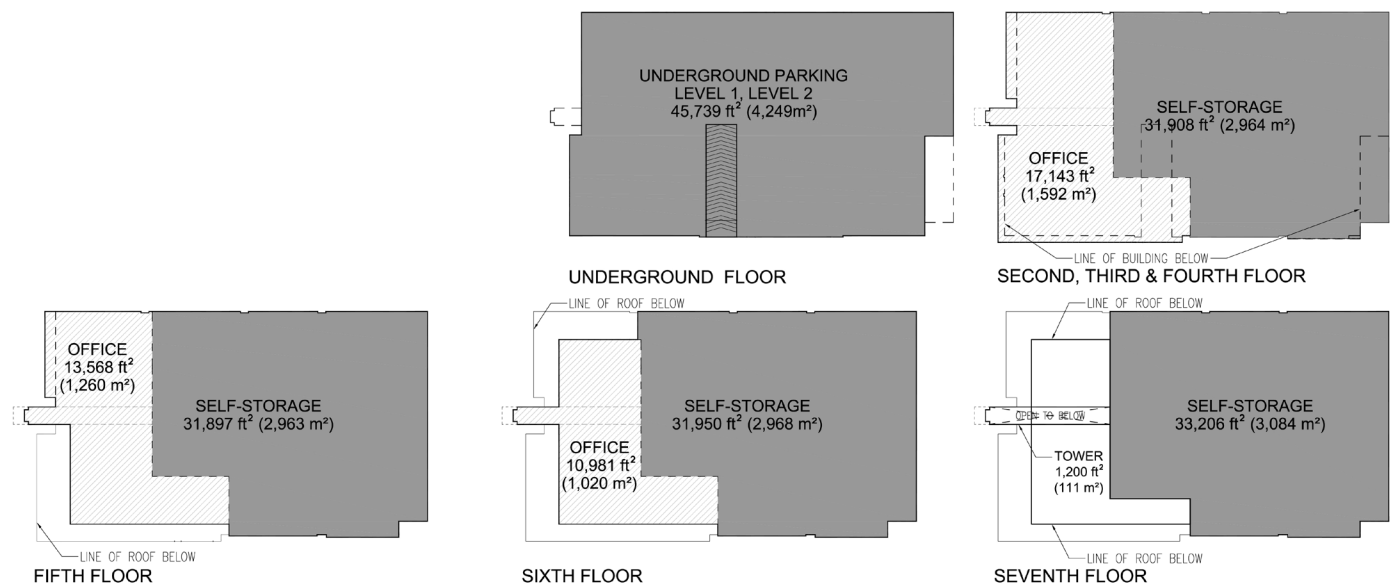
Floor Plate Plans by Nicholas Caragianis Architect Inc.
